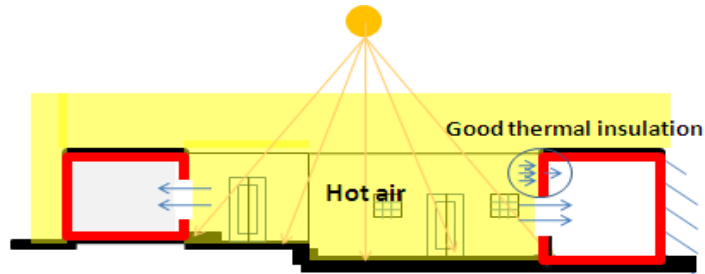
Heating system 1; in the morning (winter); opening the windows to allow air cold to enter.
